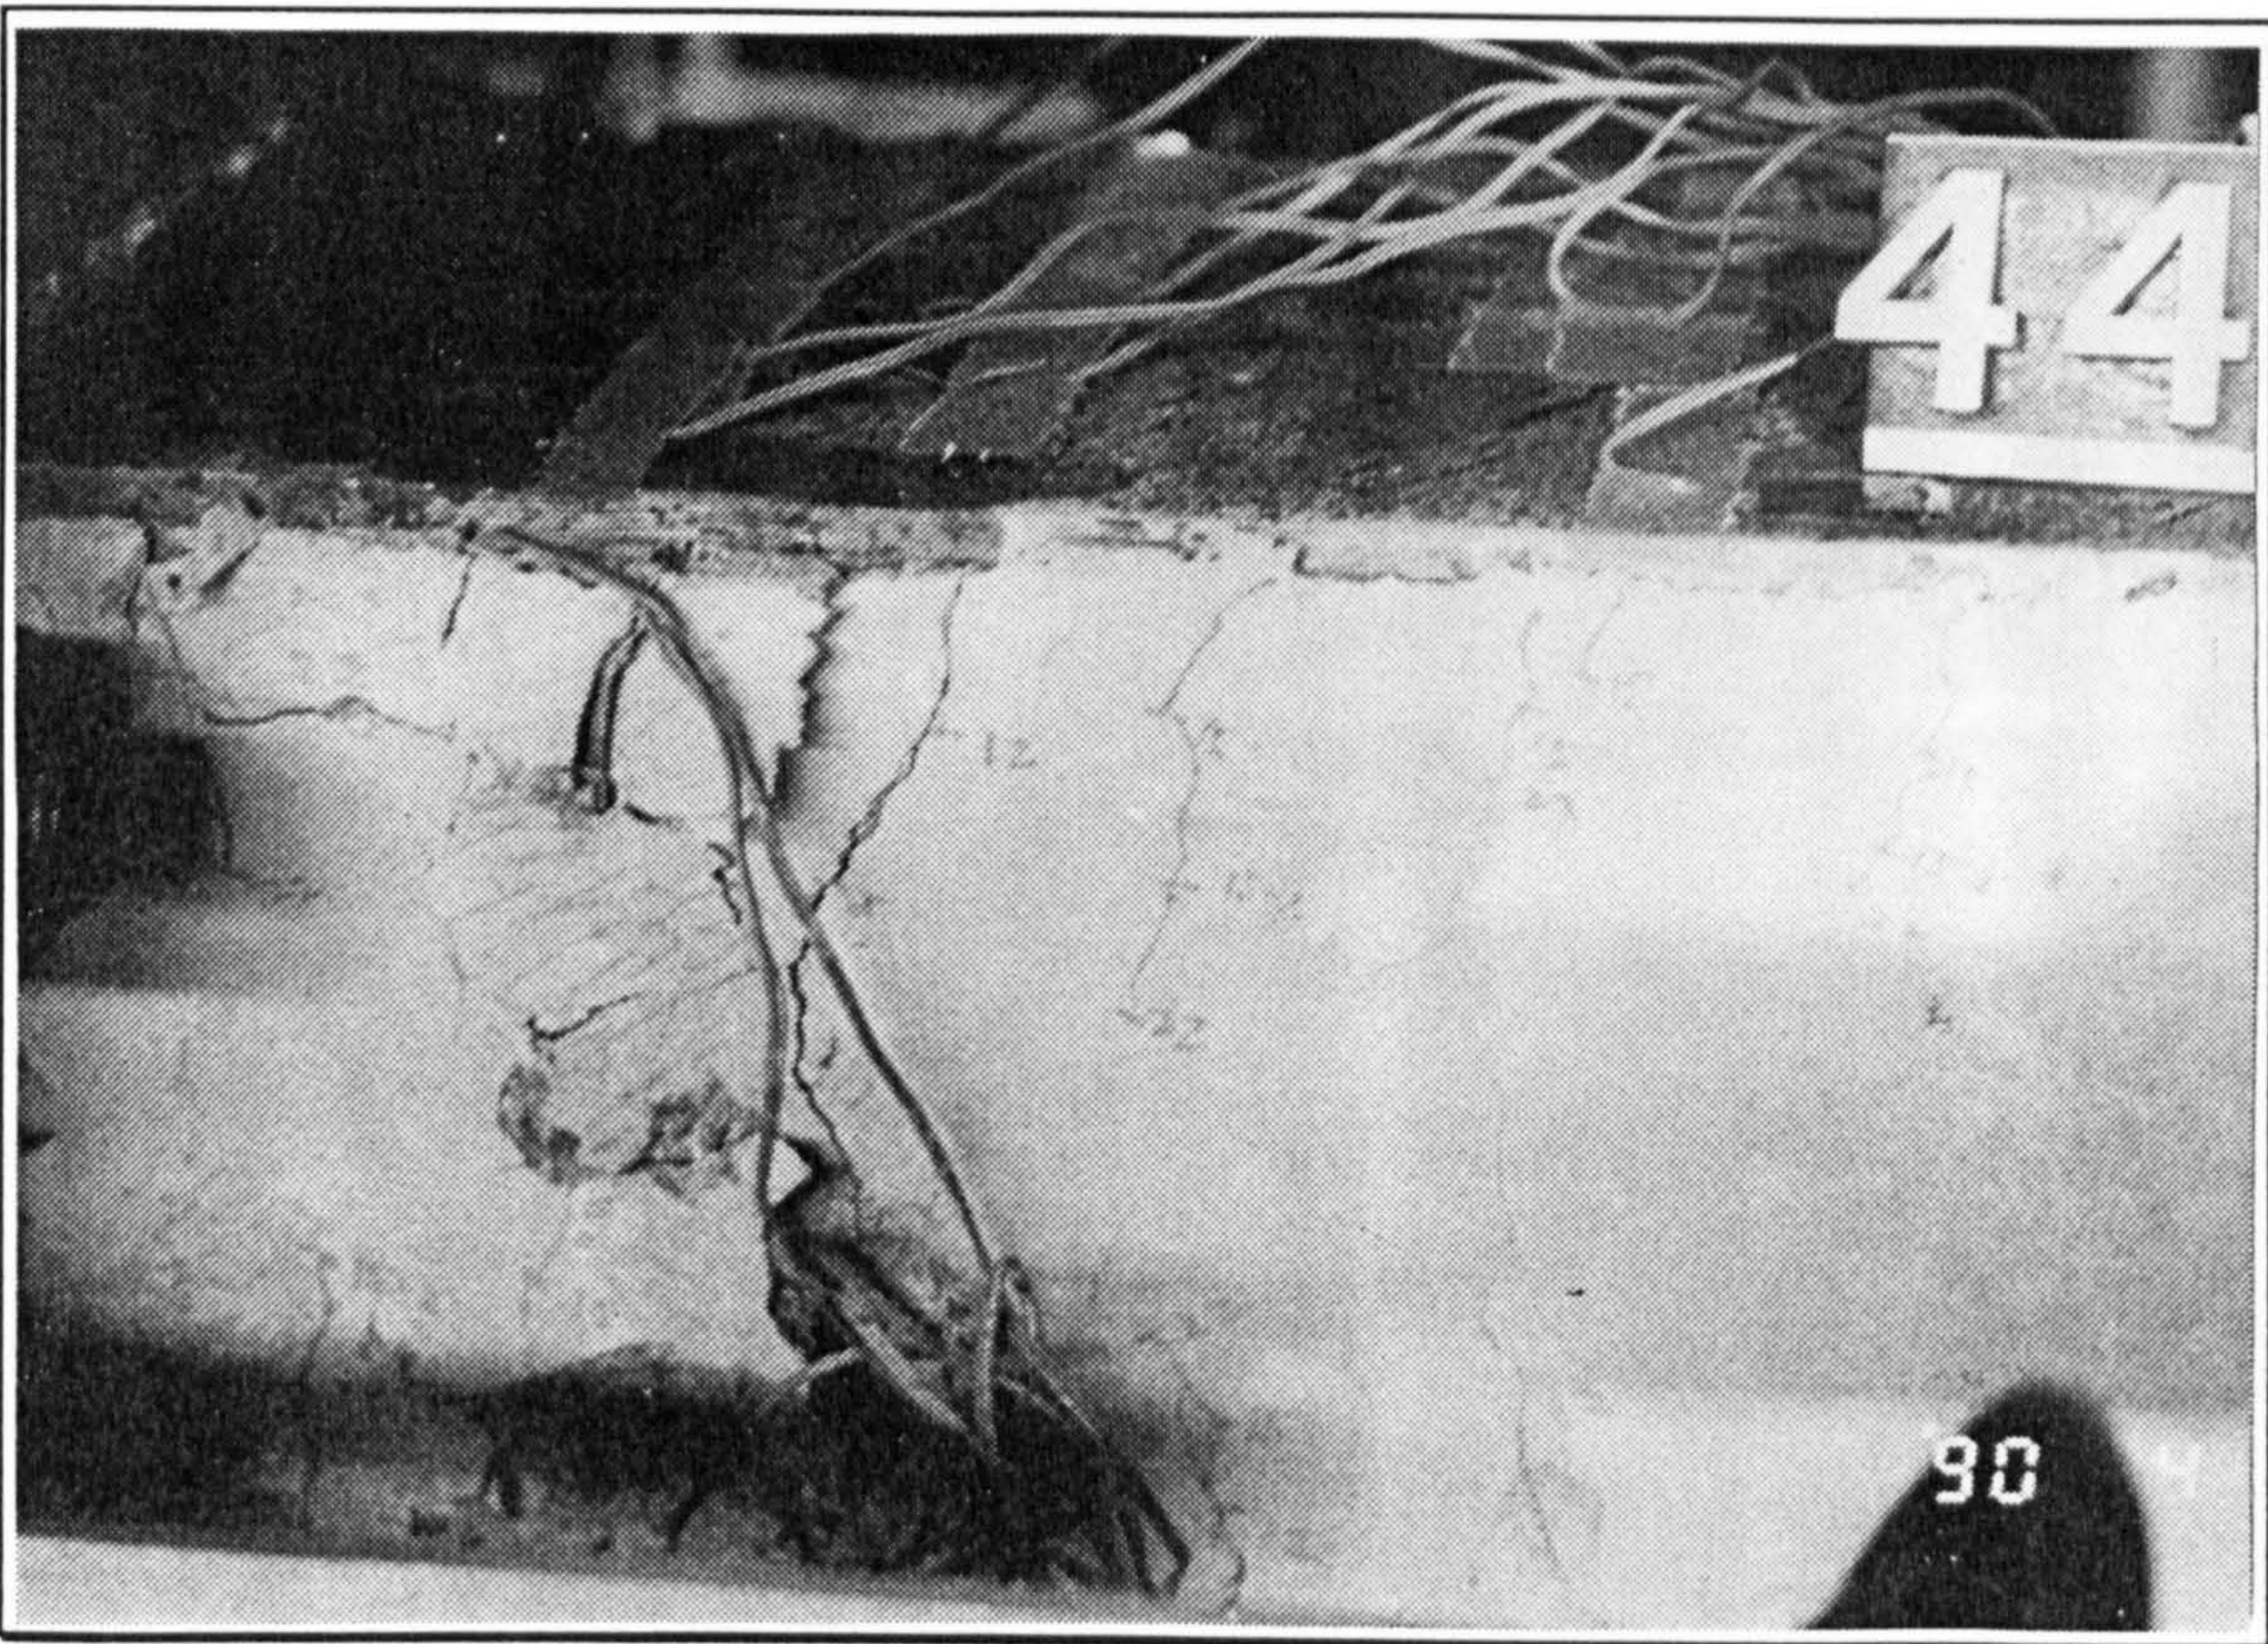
IC02 at 44 mm, cracking and spalling of cover concrete
